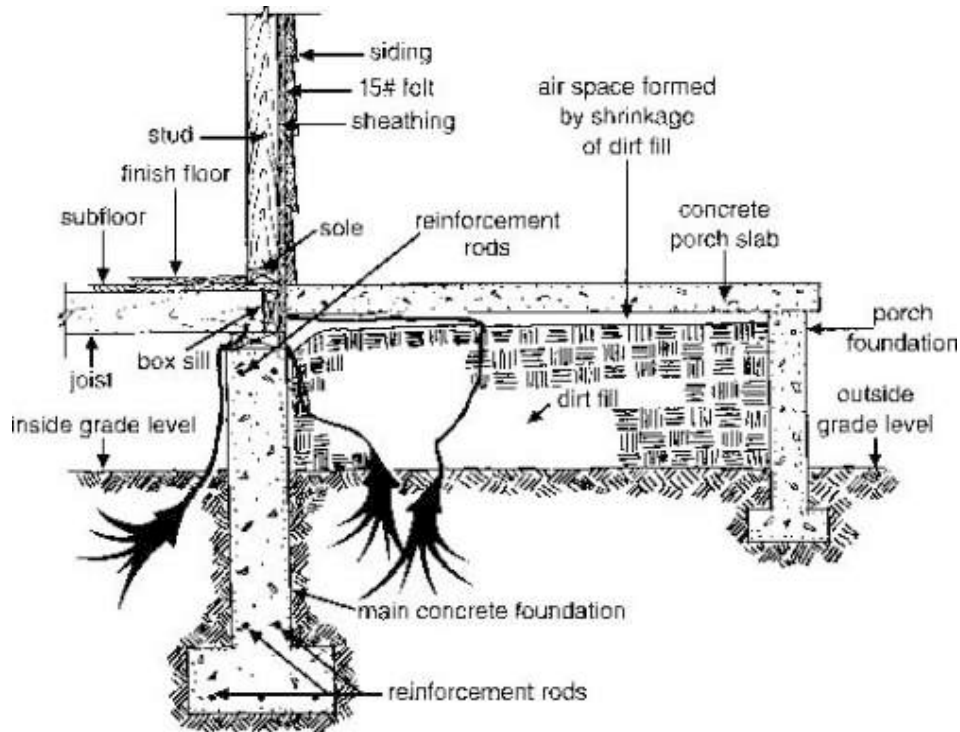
This is a common type of construction that involves a dirt-filled concrete porch attached to a frame house. Avenues of termite access are indicated by the heavy areas in the soil (NPMA).
